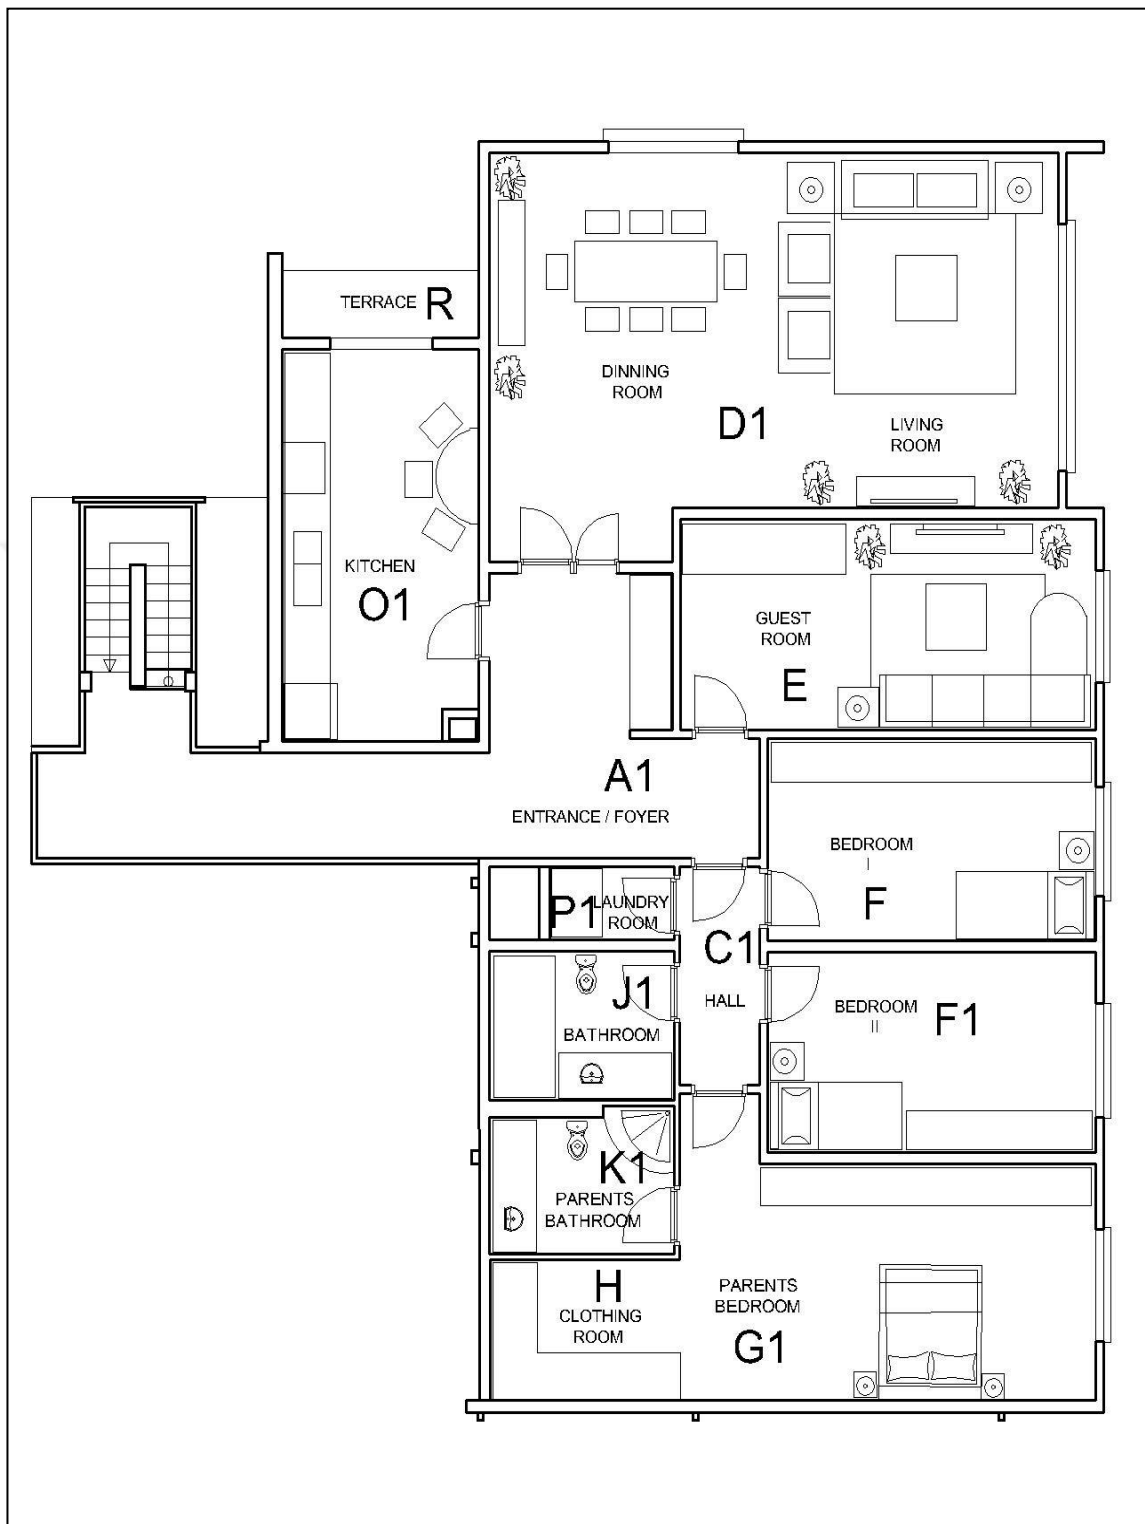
Existing upper floor plan. Standard furnishing, designed by author.
